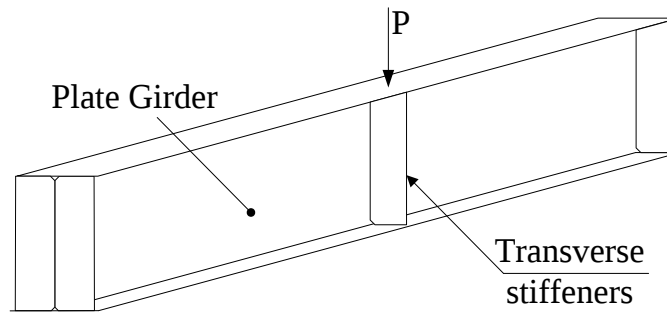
Effect of transverse stiffeners on LTB of the plate girder
